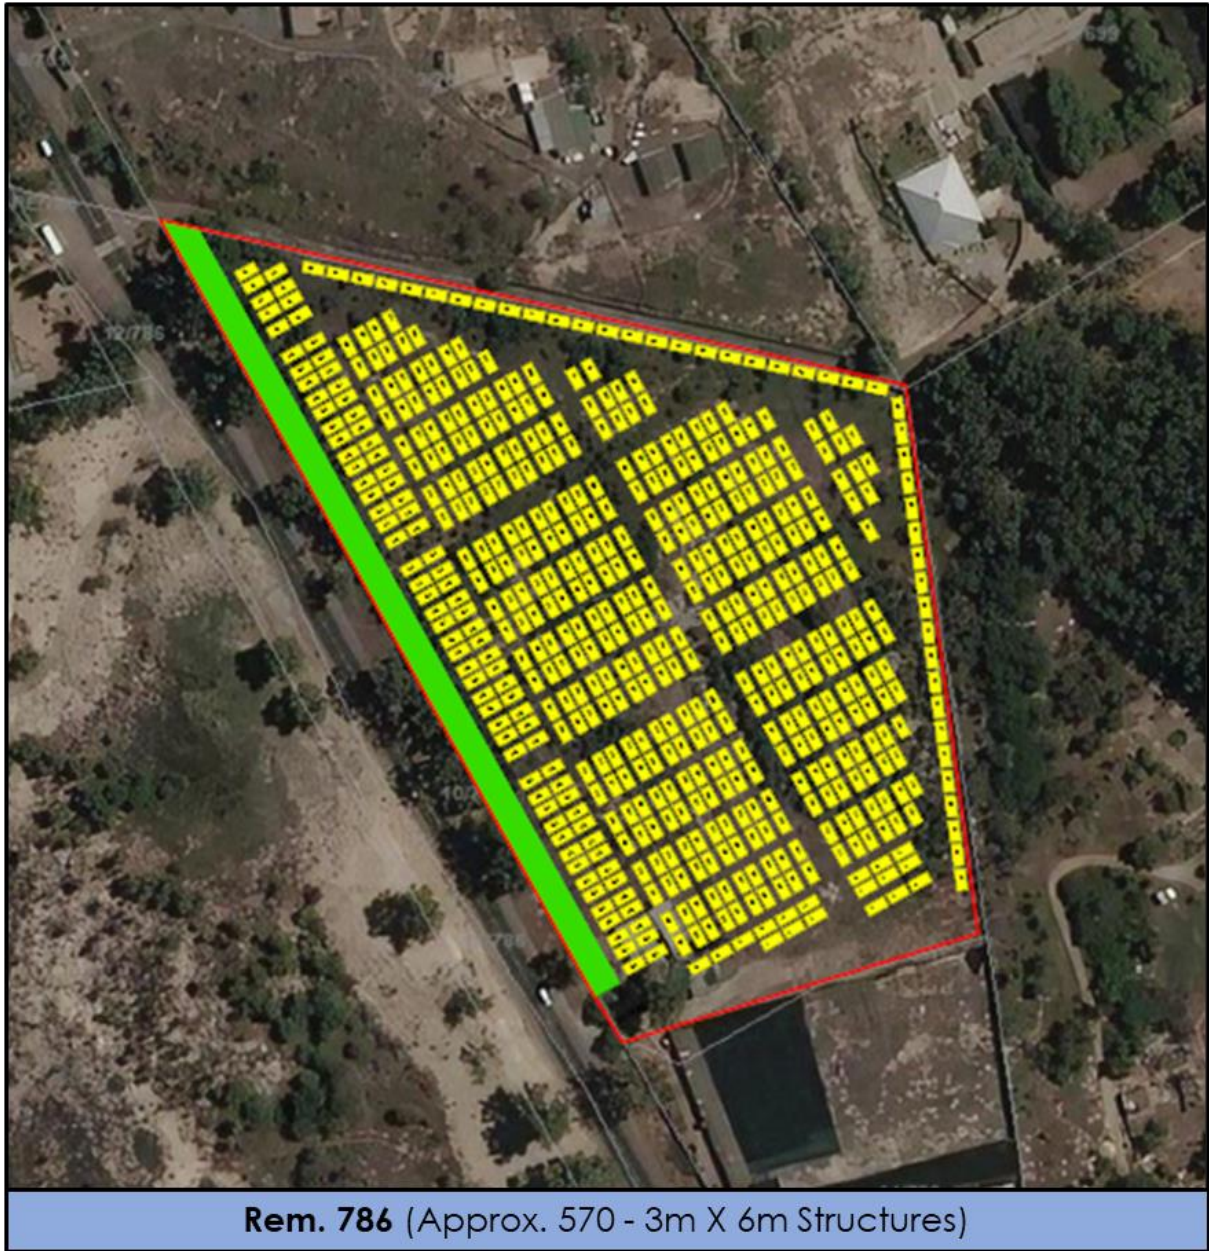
Proposed Layout for Relocation Area – Rem of Farm 786
